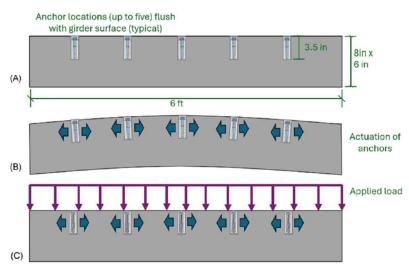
System concept for adaptive precast concrete girder. Embedded anchors are inactive when there is no load (a) and actively cause camber when load is applied (b) and final form (c).
